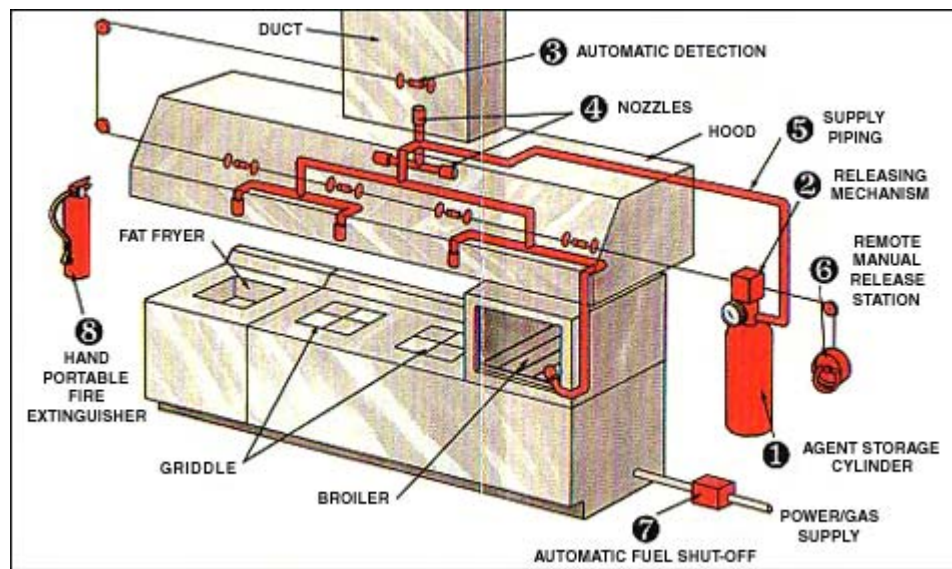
Typical automatic extinguishing system (Used with permission from Access Fire Protection Services: <http://www.accessfireprotection.com/pages/ul300kitchens.htm>)
